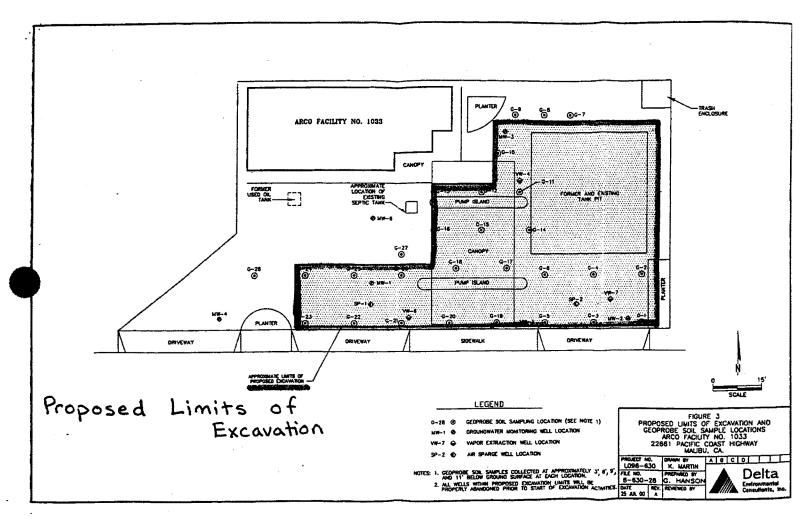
CDP 4-99-052 (ARCO) PROPOSED EXCAVATION
